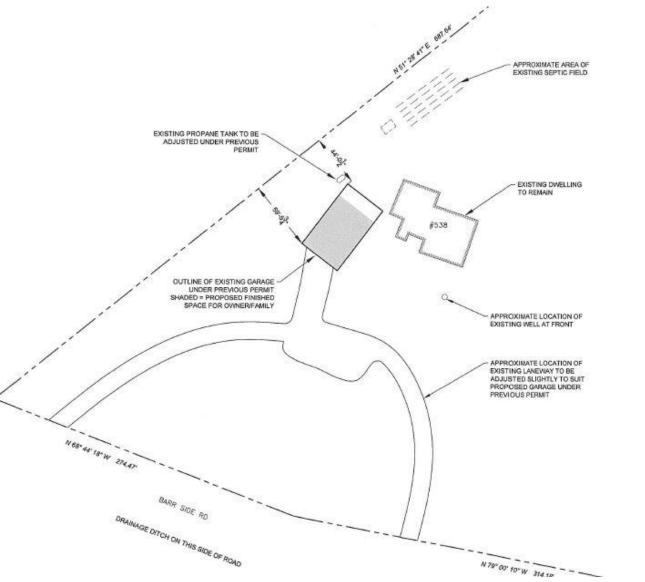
Location of existing services, buildings and driveways on the Subject Property
